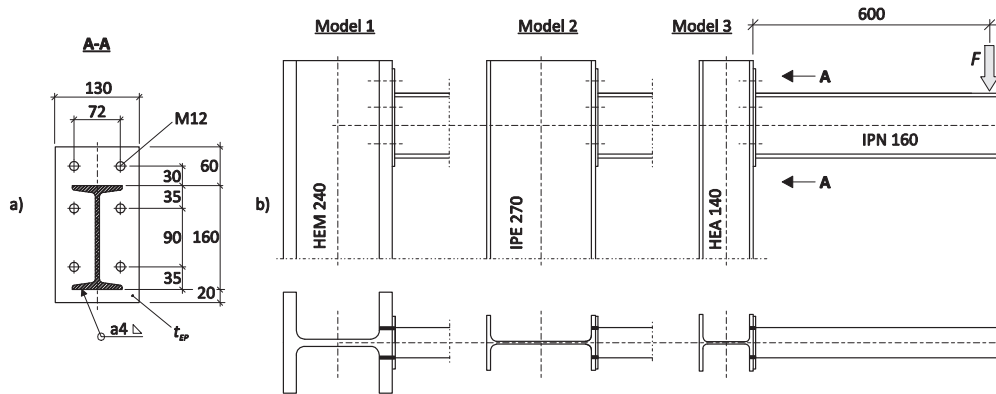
a) Geometrical arrangements of bolts, b) Joint models
